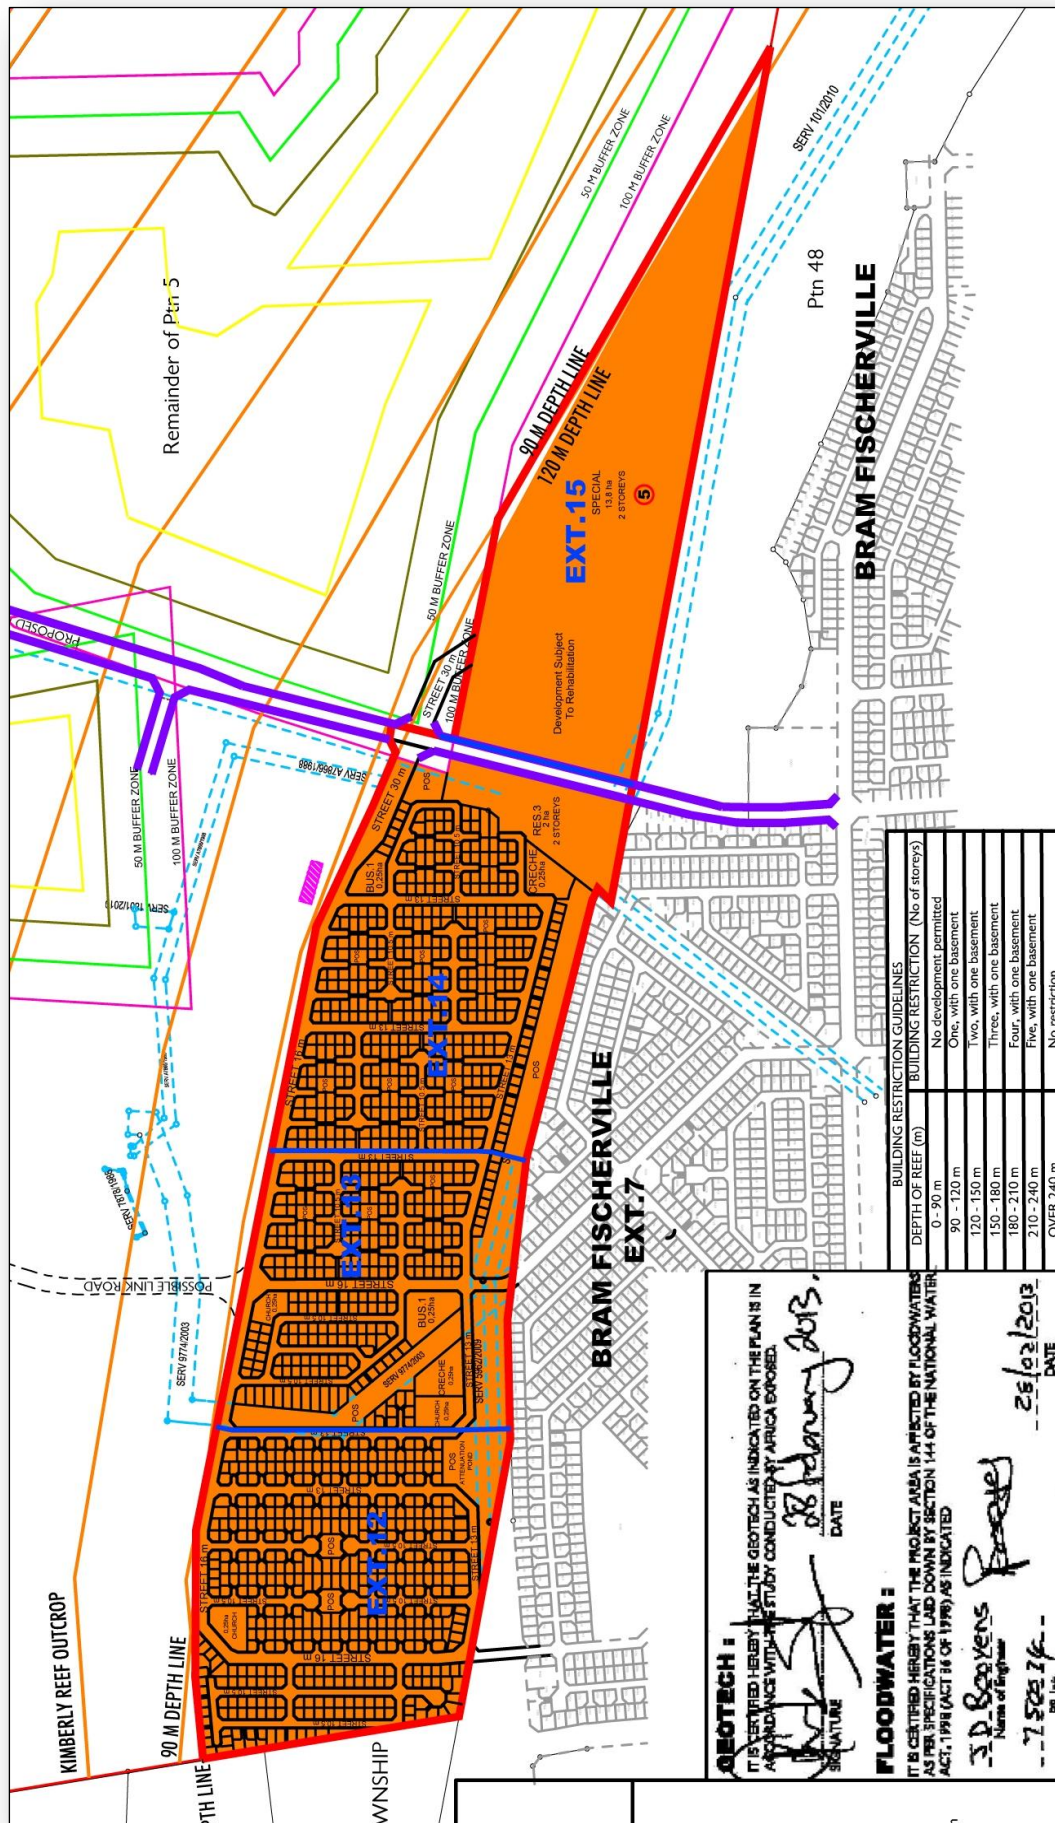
Development layout plan for Goudrand Ext. 12, Goudrand Ext. 13, Goudrand Ext. 14 and Goudrand Ext. 15.
